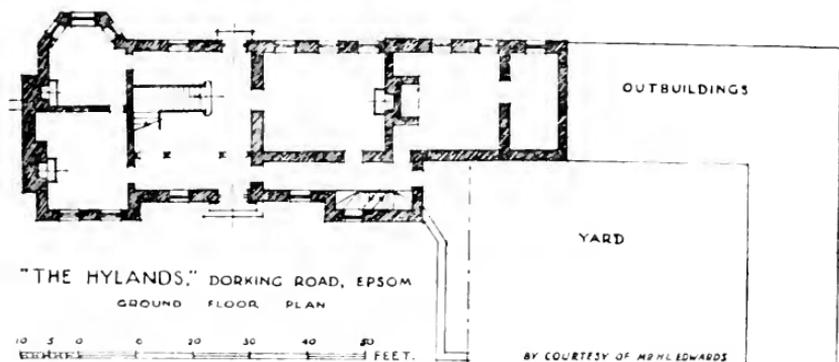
THE HYLANDS, EPSOM: GROUND FLOOR PLAN.
